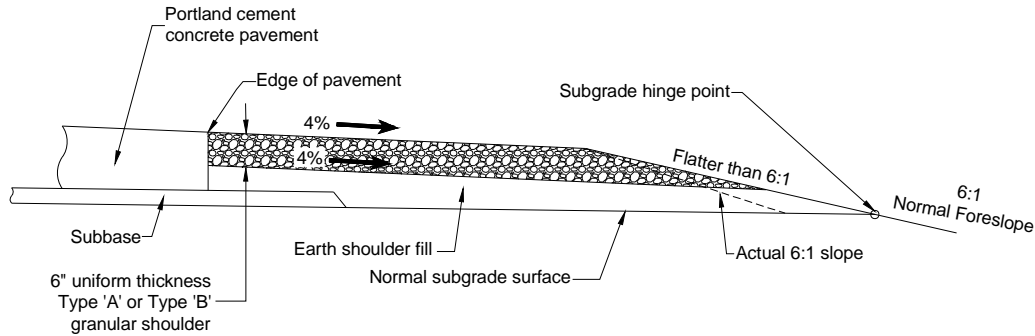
Iowa DOT granular shoulder section (modified from Iowa DOT Standard Road Plan RH-37D)
